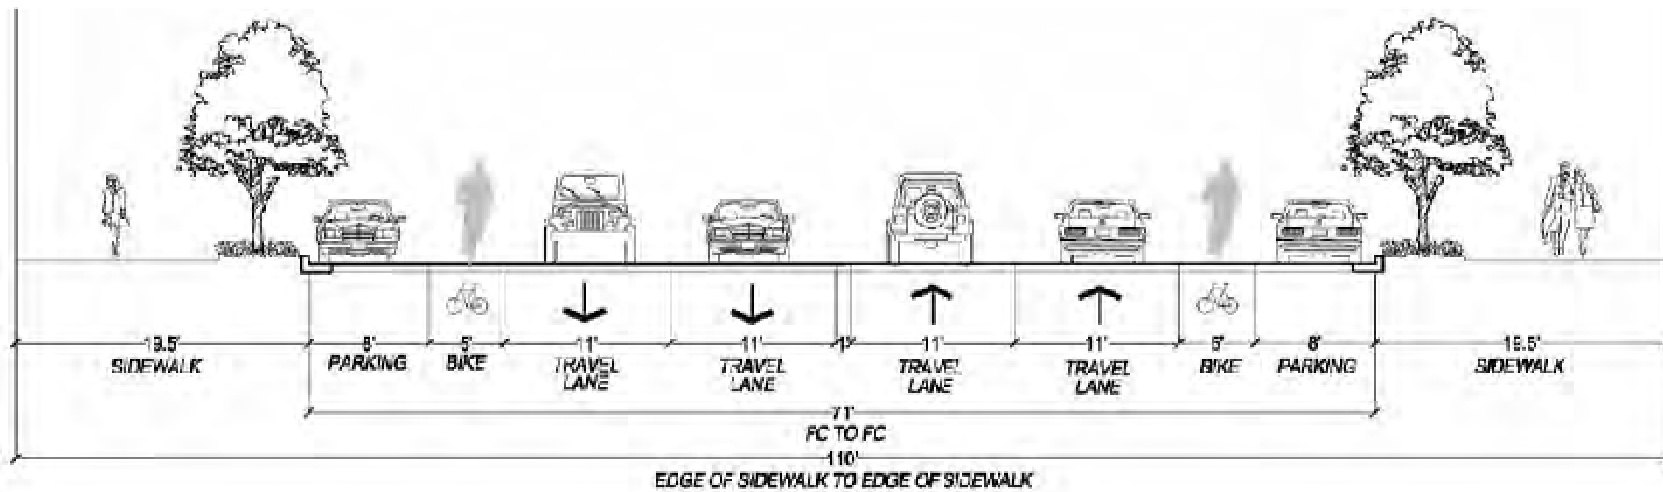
Recommended mid-block cross-section for S. Eads Street north of 23rd Street S.
